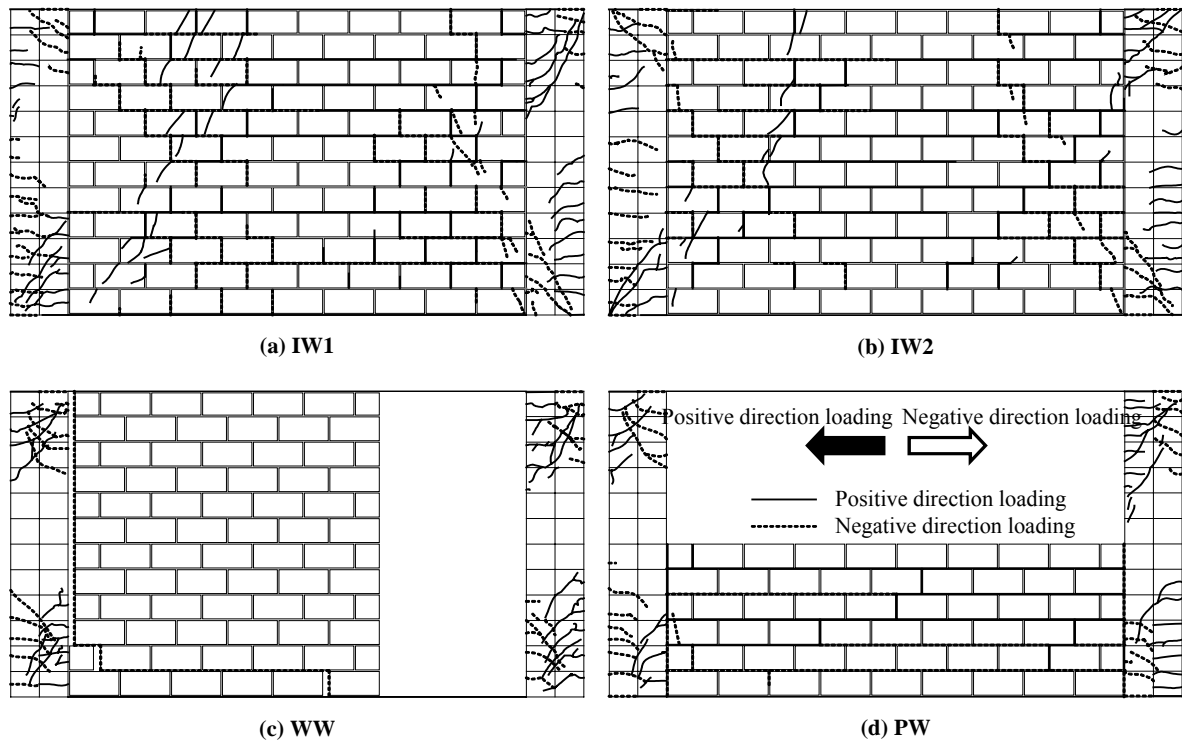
Cracks in RC columns and CB wall at the 1st cycle with peak drift angle of $+10 \times 10^{-3}$ rad.
